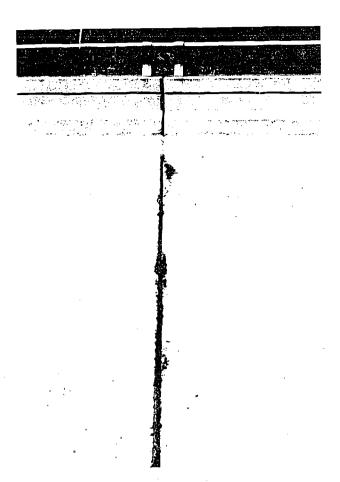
Sealed deck joint. A premolded filler topped with a poured-in-place sealer has been used.
